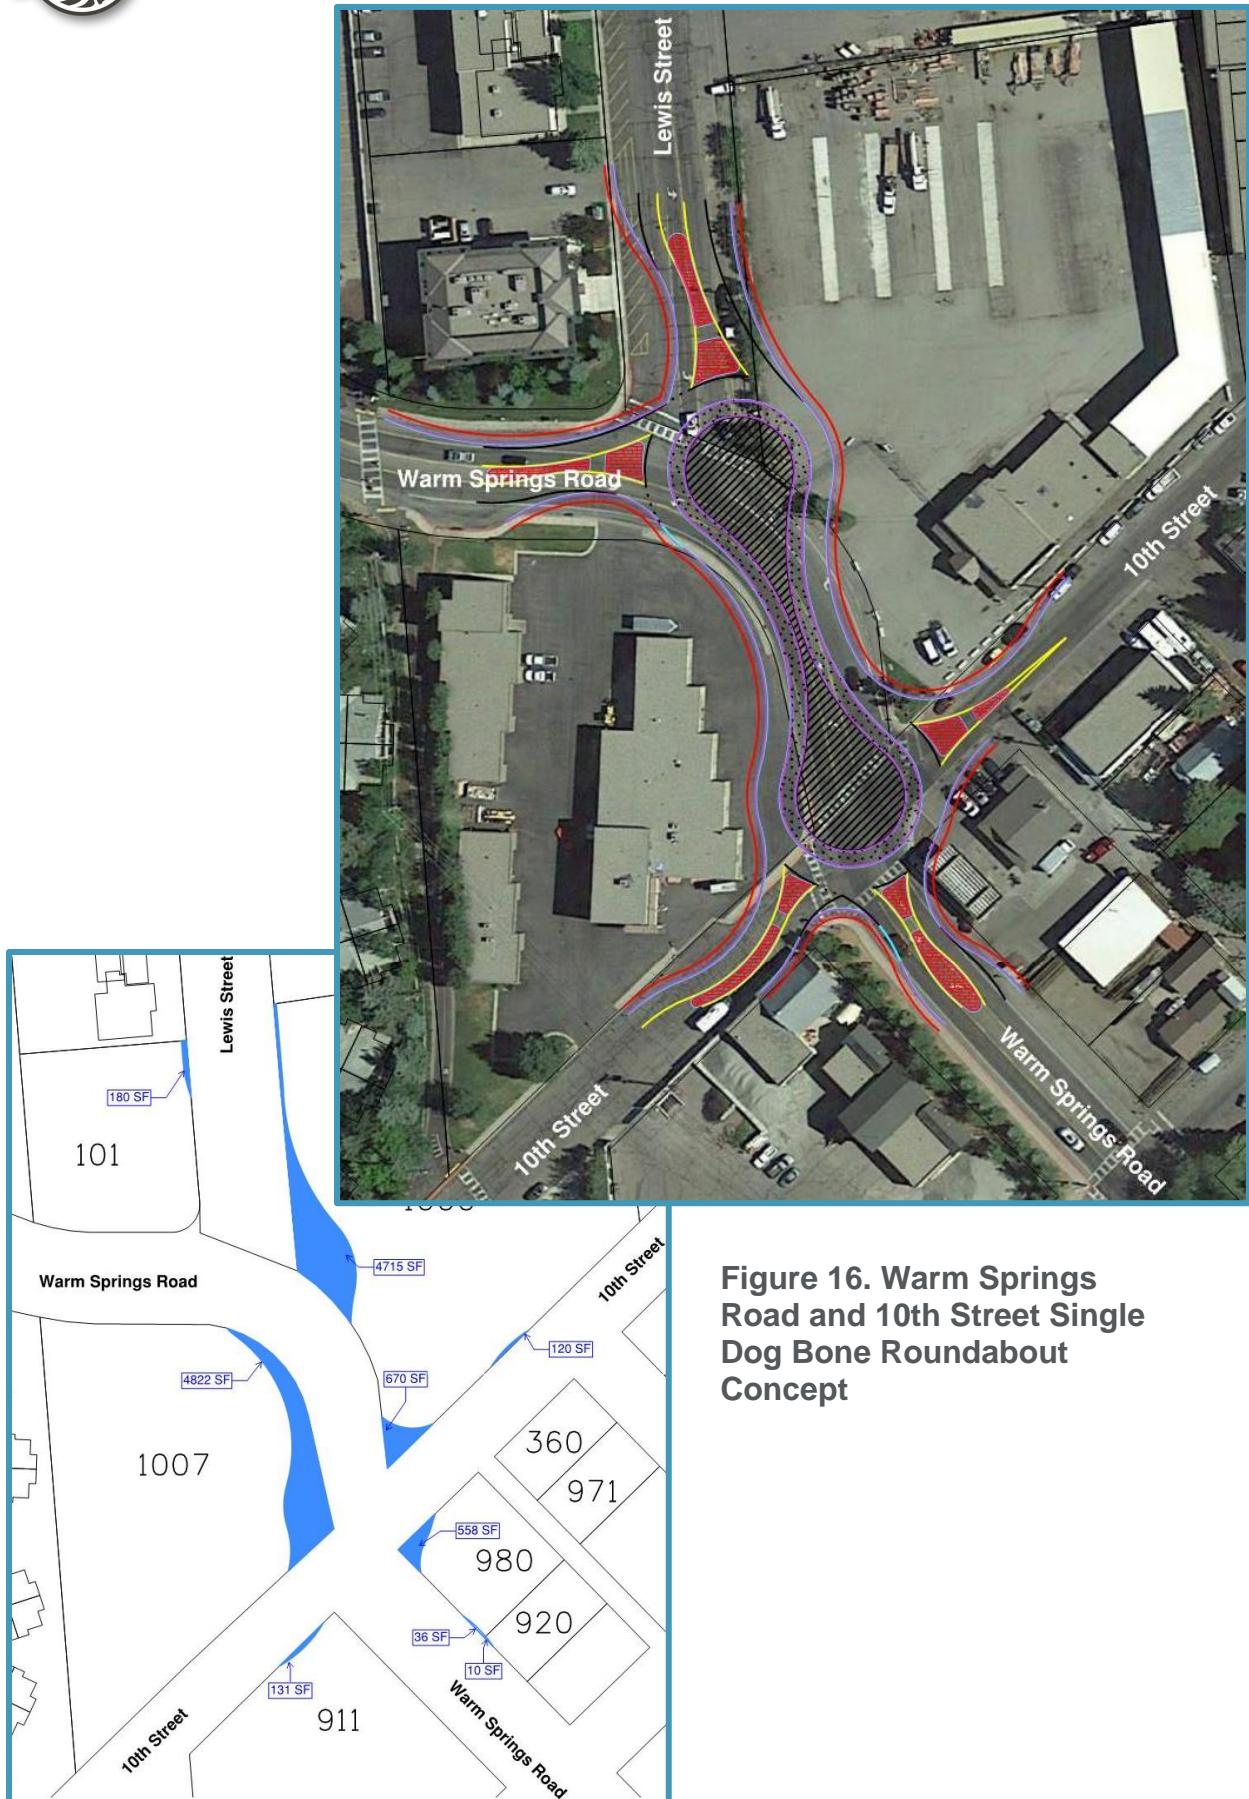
Warm Springs Road and 10th Street Single Dog Bone Roundabout Concept
